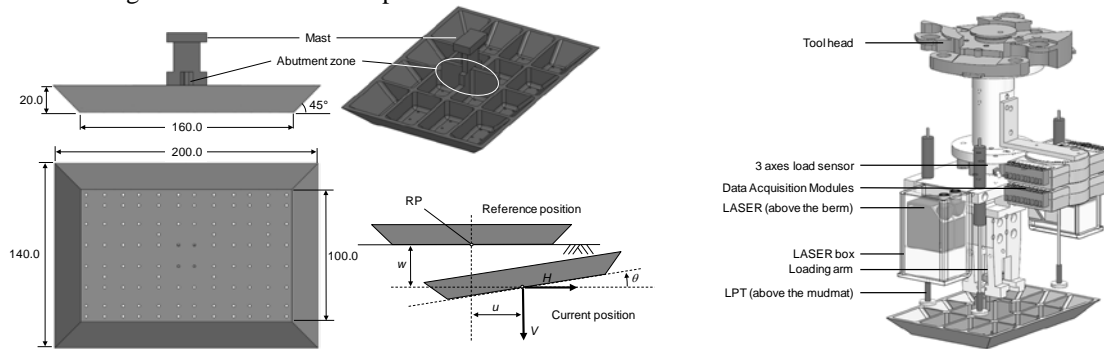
Sliding foundation - model (left) and instrumented tool developed for the robot (right)
